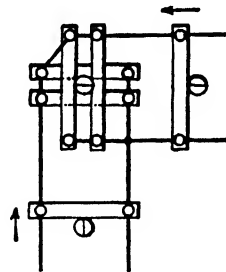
Facing crossarms at a corner. Adjacent poles face the corner.
